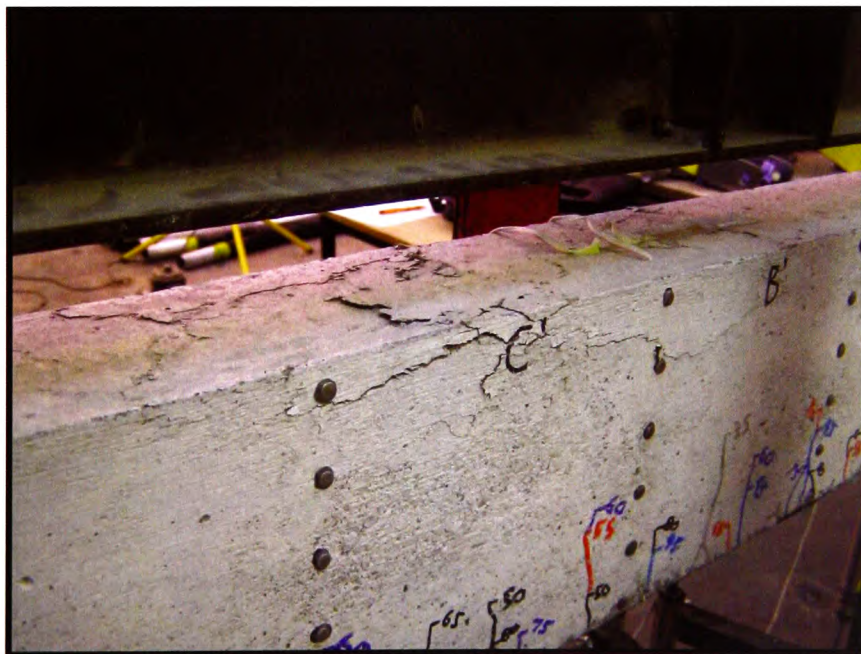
Photograph of compressive concrete failure of 12CF3
